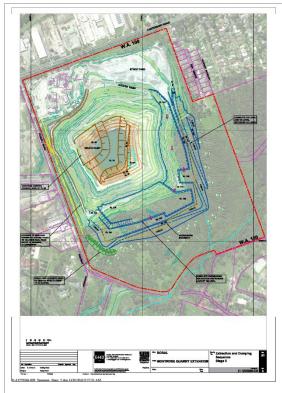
Proposed Expanded Pit – Stage 5 (source GHD)
